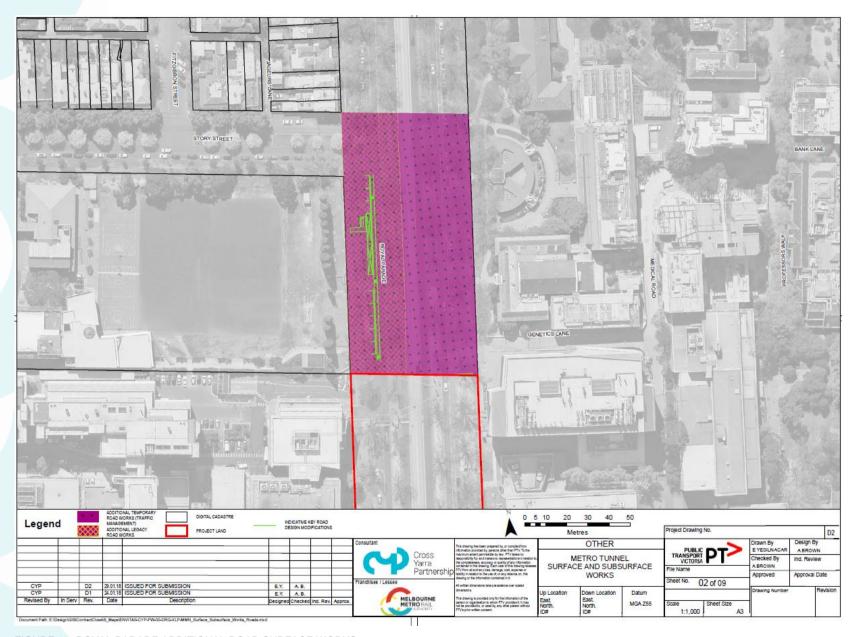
ROYAL PARADE ADDITIONAL ROAD SURFACE WORKS
